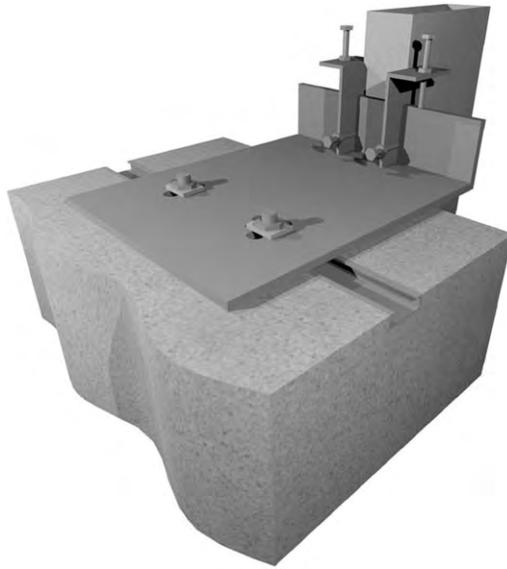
The cast-in anchor attaches vertical mullions to structural floor elements
